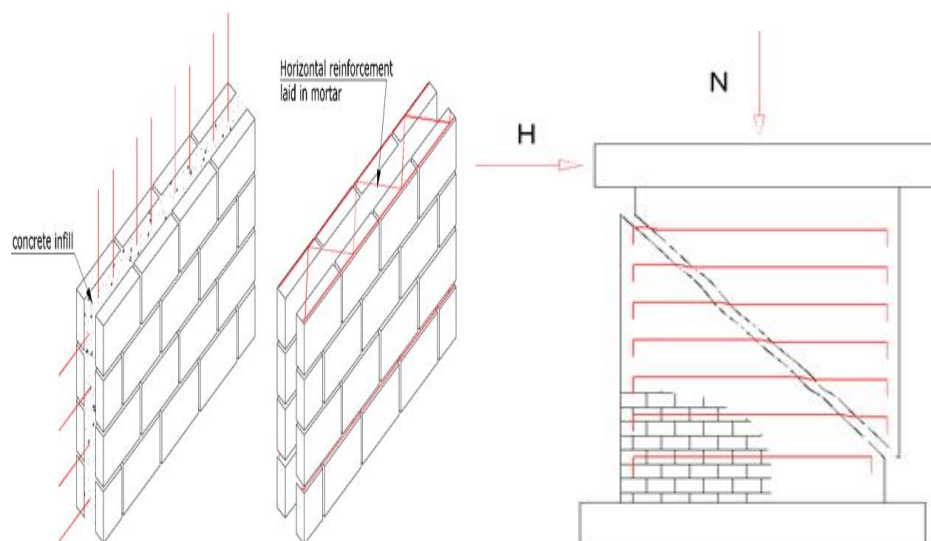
Reinforced masonry and expected failure mechanism of wall loaded by horizontal load [10]
